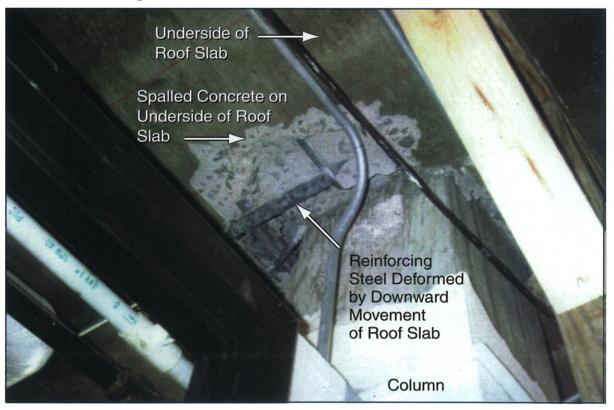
Damage to underside of roof slab in Water Resources building.
